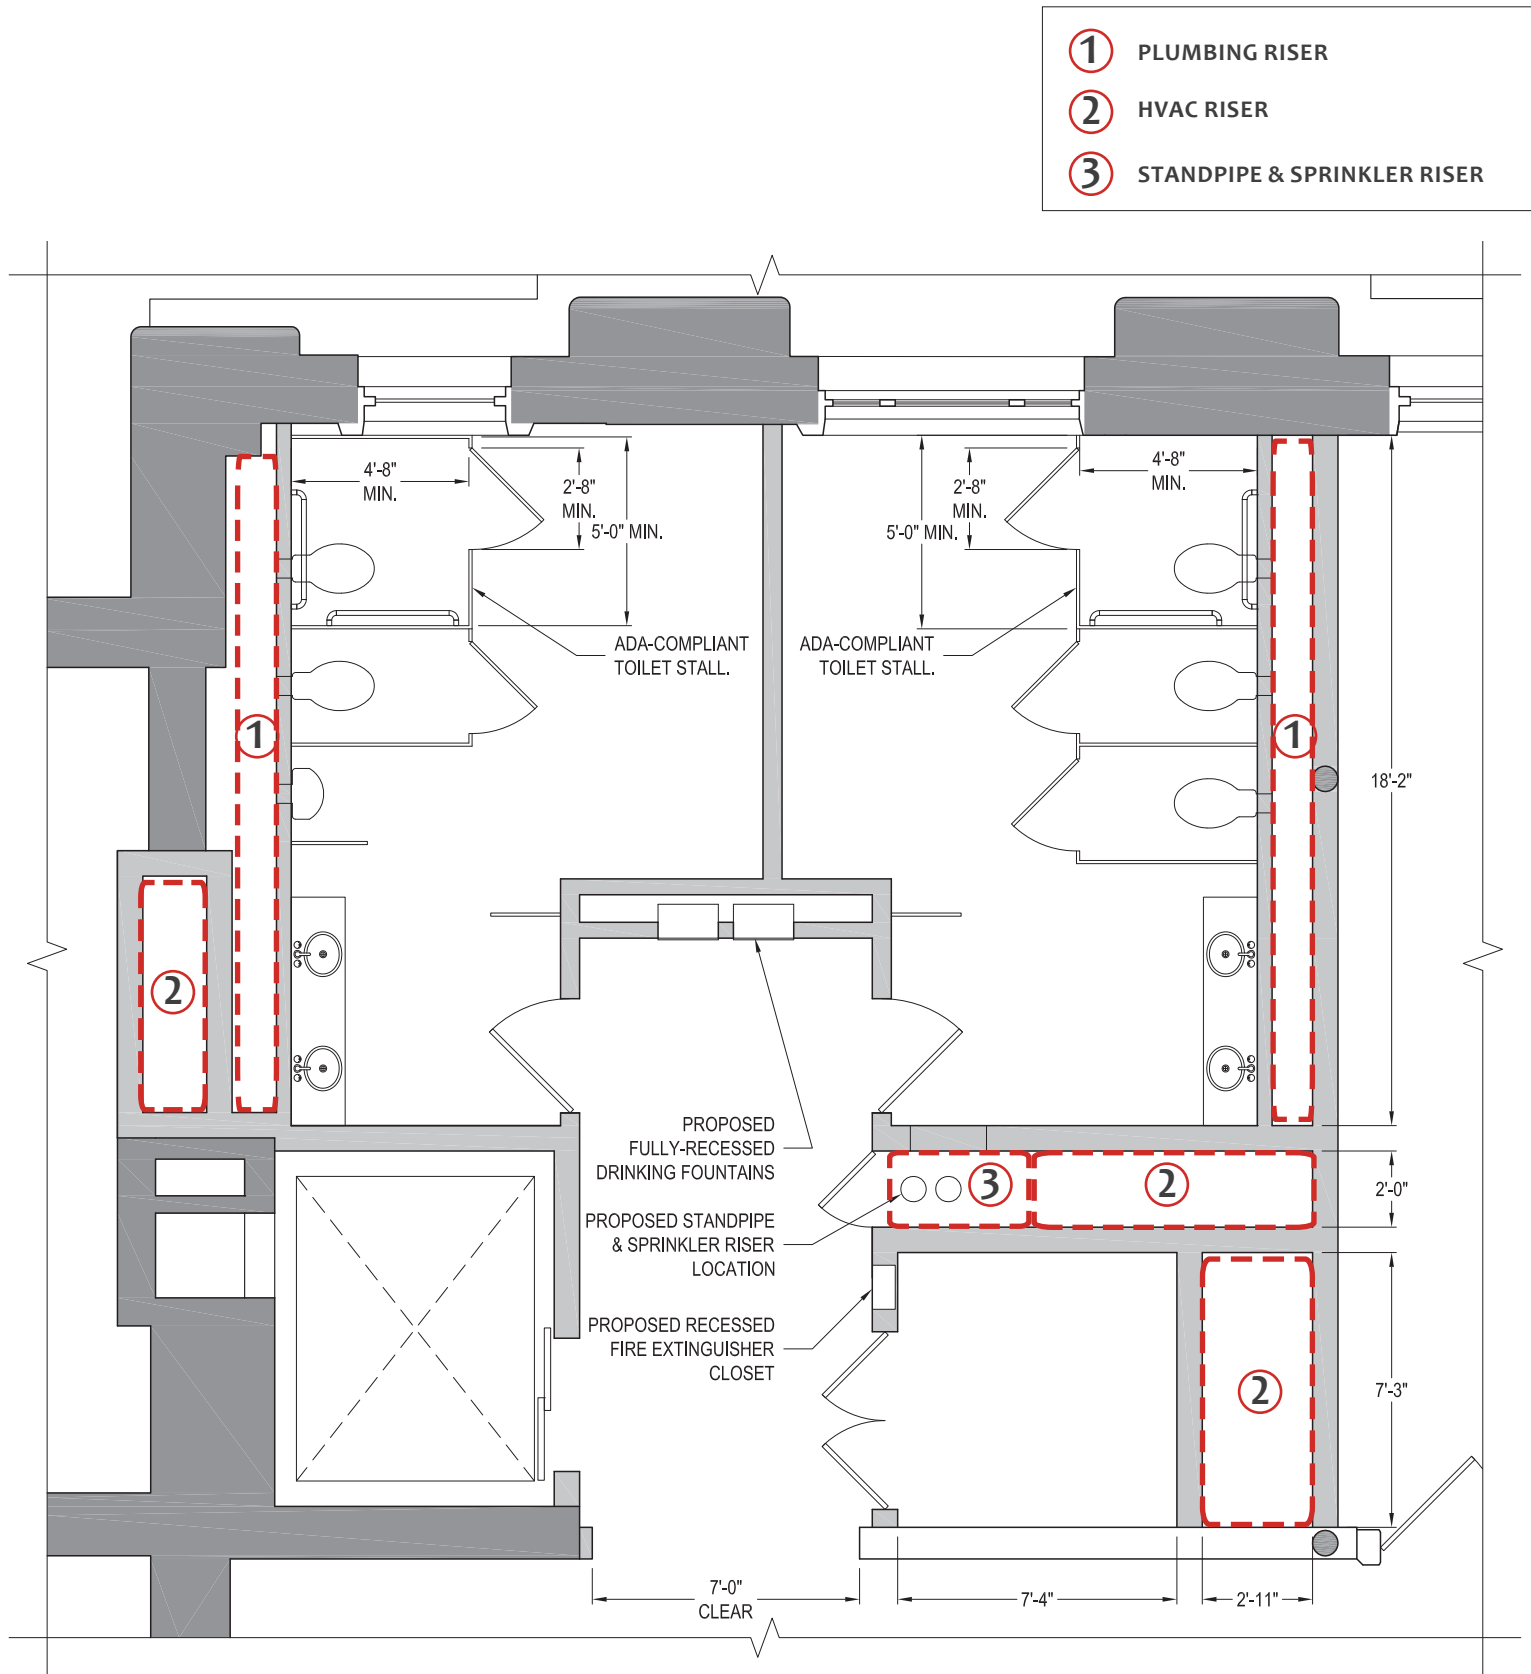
First Floor Level [East] Proposed Service Core.
